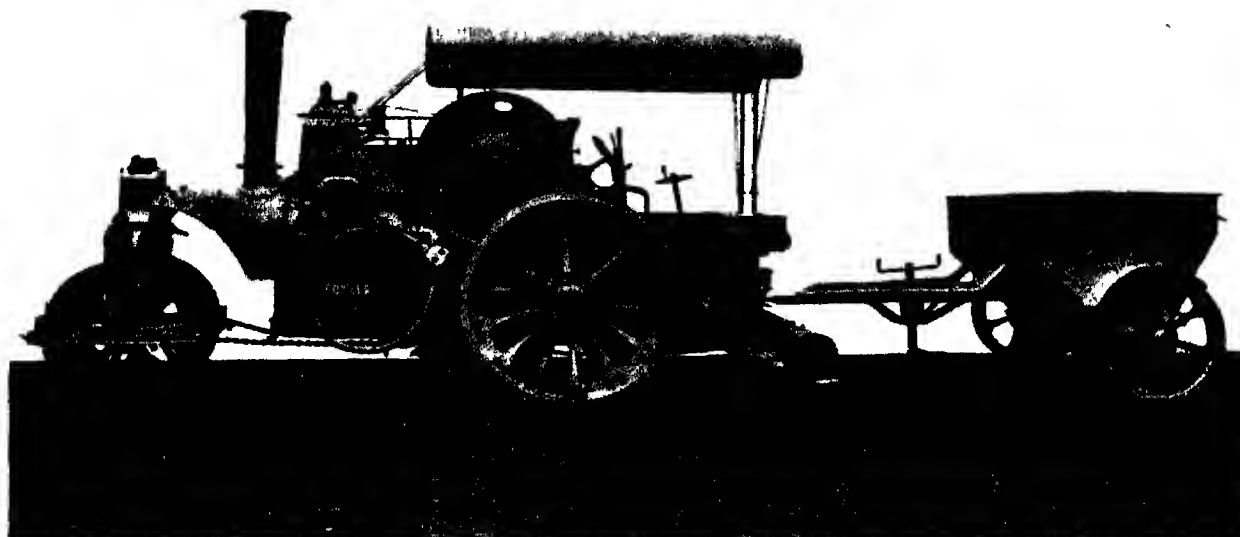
TAR-SPRAYING STEAM ROLLER WITH MECHANICAL GRIFFER ATTACHED
